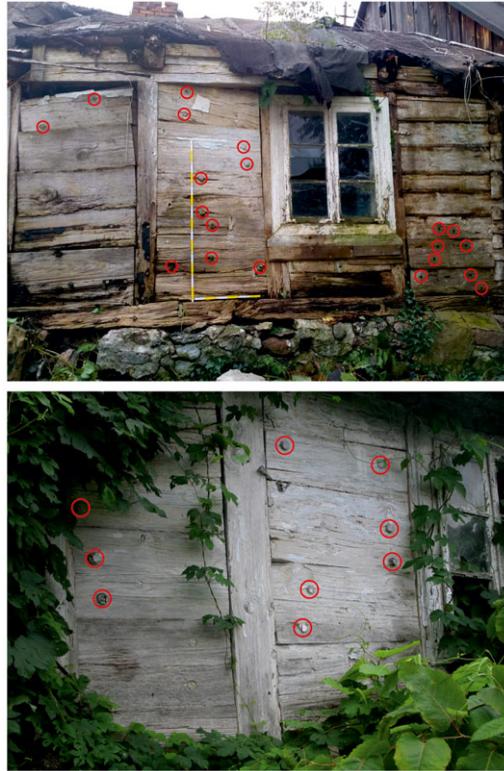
Residential buildings in Czerwińsk built using boatbuilding material – location of boatbuilding pegs marked (photo: P. M. Pogodziński and R. Piotrowski).
